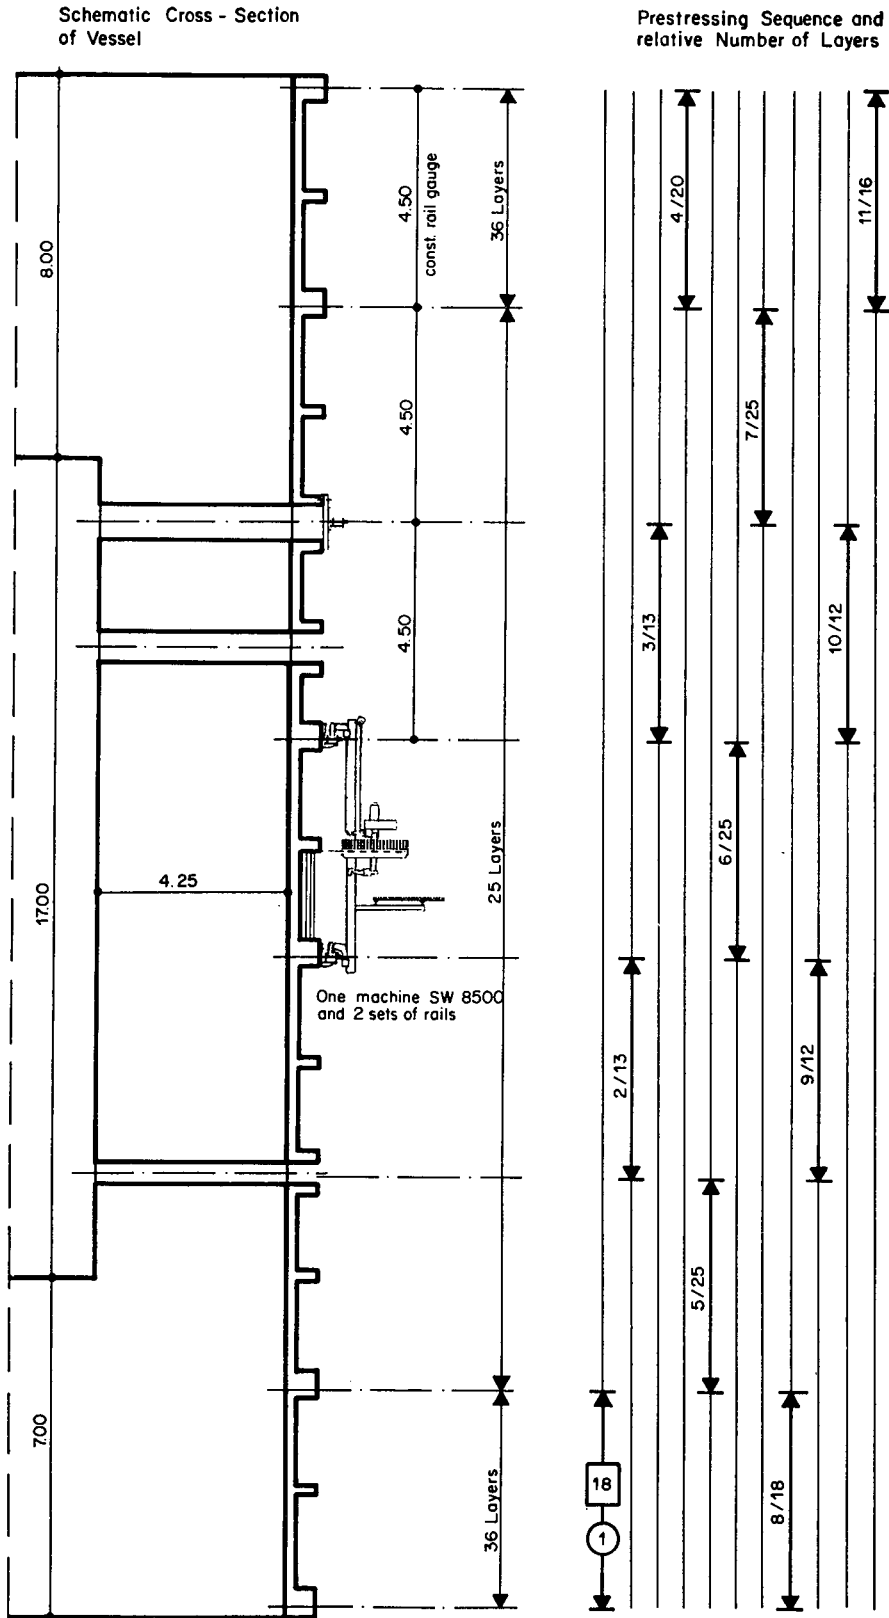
HTR 500 vessel with pattern of winding channels and rails
